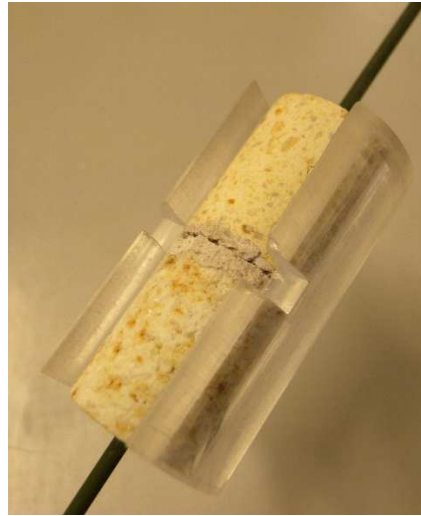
Brick/mortar specimen for tension test and its mould [10].
